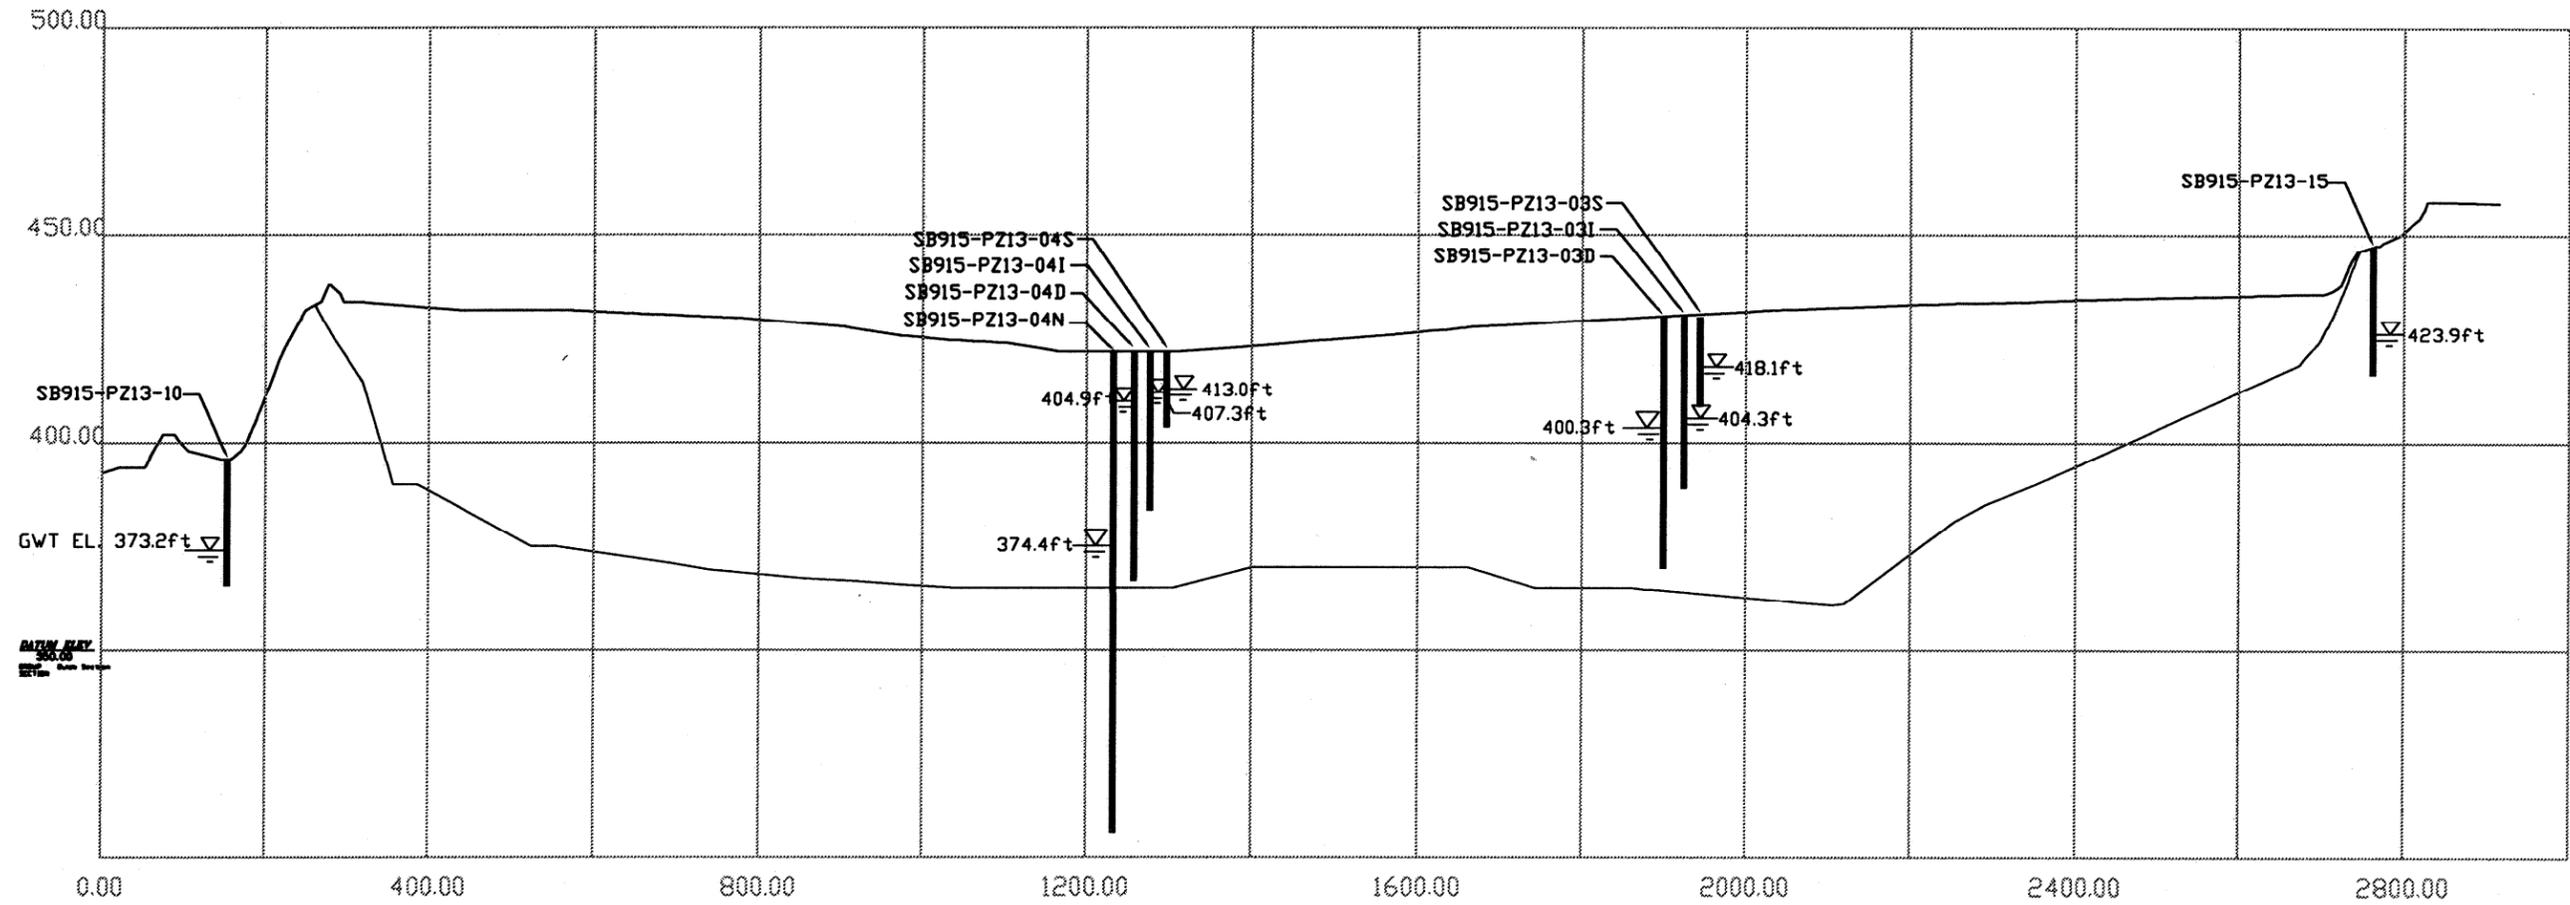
Measured Groundwater Table Elevations on Cross Section 2
